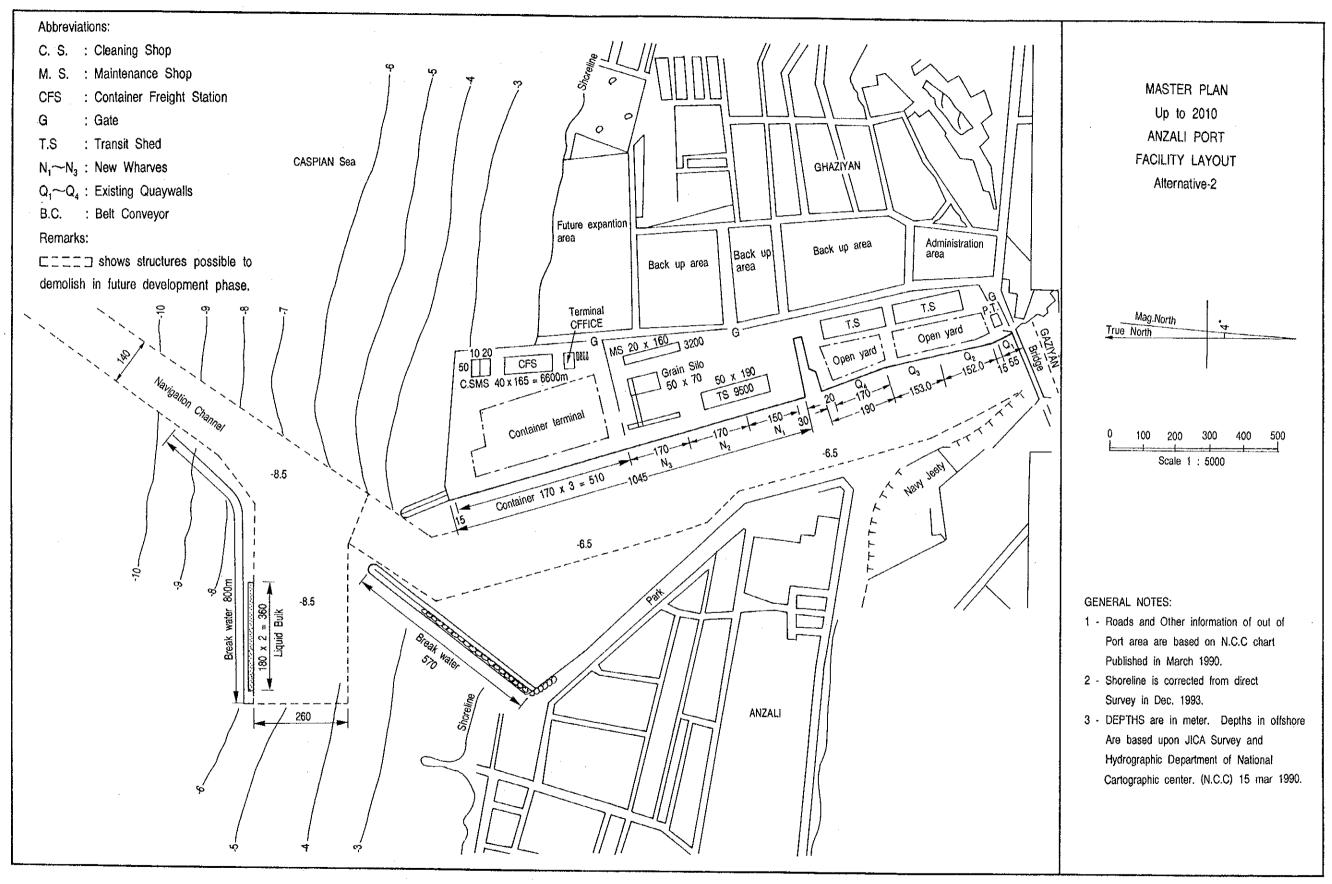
Alternative Plan 2 (Master Plan)
